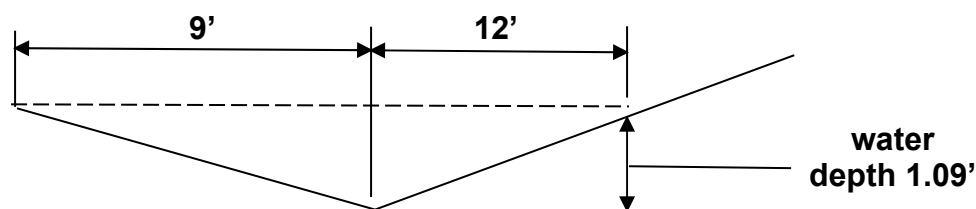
Cross-Section, Drainage Channel Section Four, 90' south, Looking North
